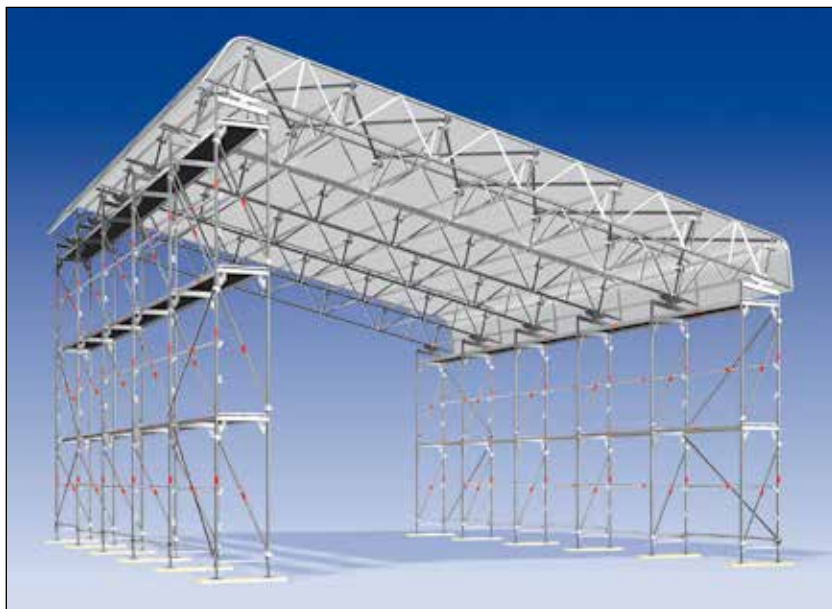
Mono-pitch roof (truss external dimension 10.14 m)
